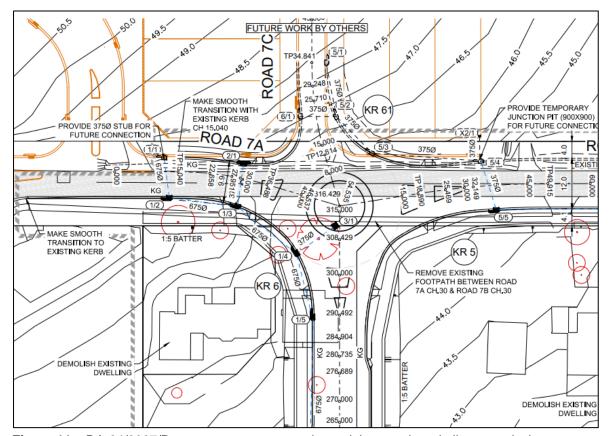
DA-64/2007/D – most recent approved roundabout and road alignment design
